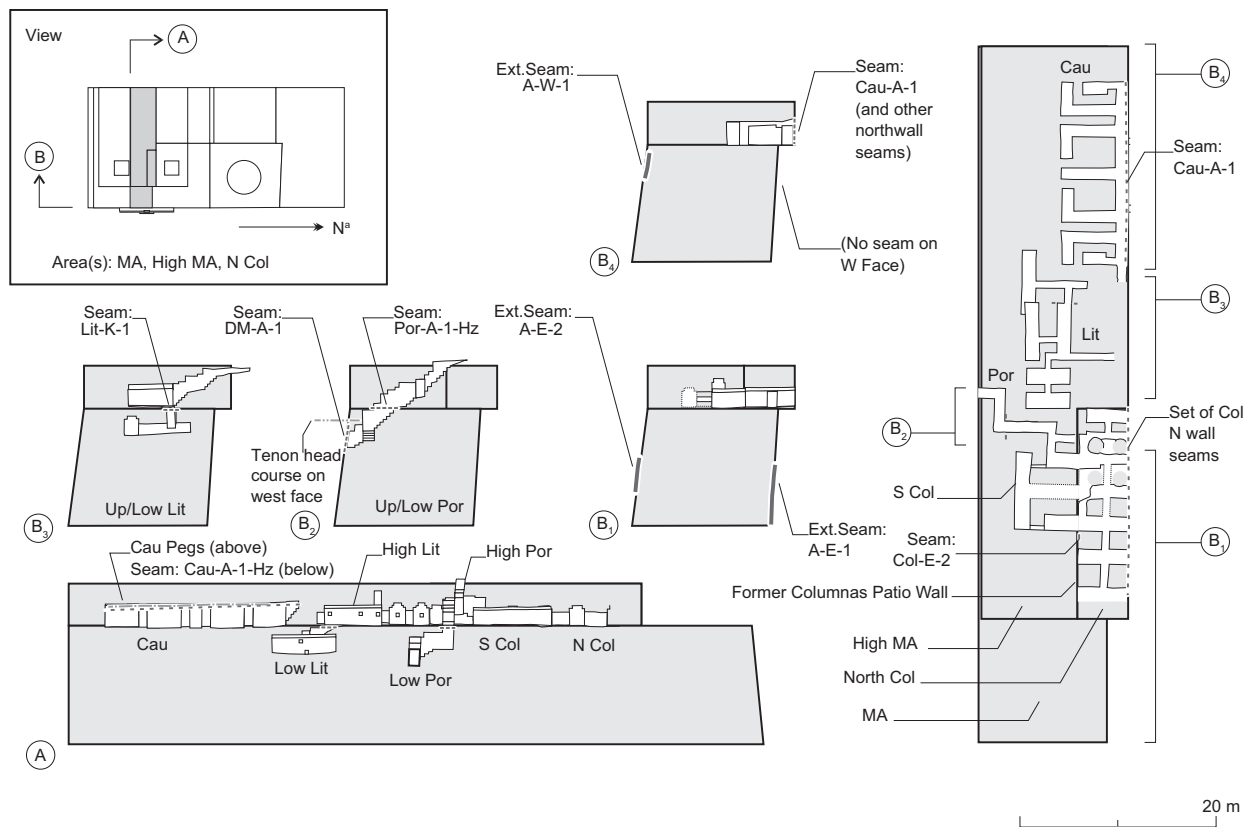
Examples of spatial relationships of internal and external architecture within Building A; plan and architectural north (A) and segmented west (B) profile views. This portion of Building A was built in three different construction stages. The lowest portion, the MA, was built during the Expansion Stage. The larger of the two upper portions, the High MA, was built during the Consolidation Stage and included the Columnas Patio. The North-Columnas-Vigas Gallery episode was built during the Black and White Stage, filling in the Columnas Patio. Note how access to earlier galleries was maintained during the addition of later phases by the construction of new gallery episodes. For full details of Building A's construction phases, see Kembel 2001.
